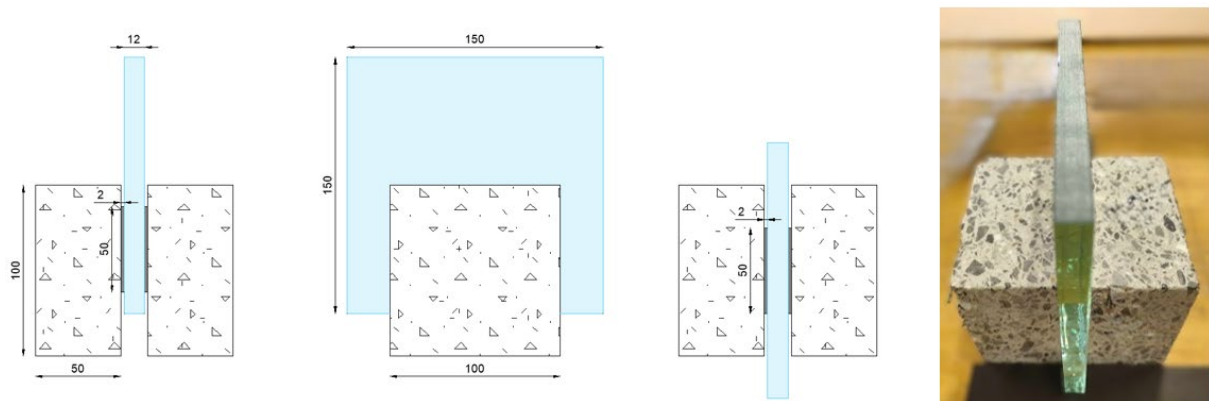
Compressive double-lap shear test specimen (left-to-right: front view, side view, top view, photo).
